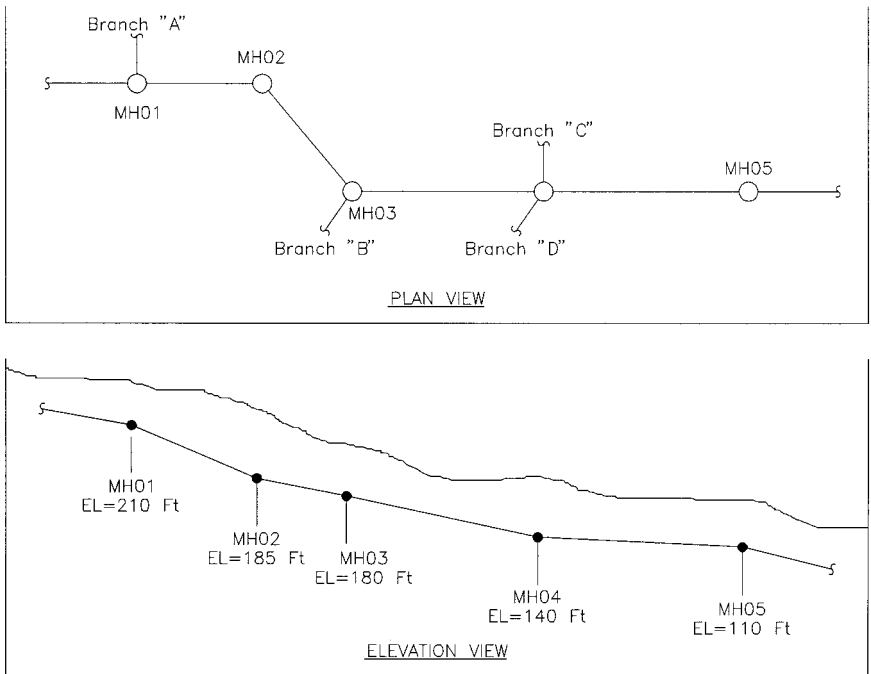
A typical combined plan- and profile-view drawing for an underground gravity-flow chemical sewer.
